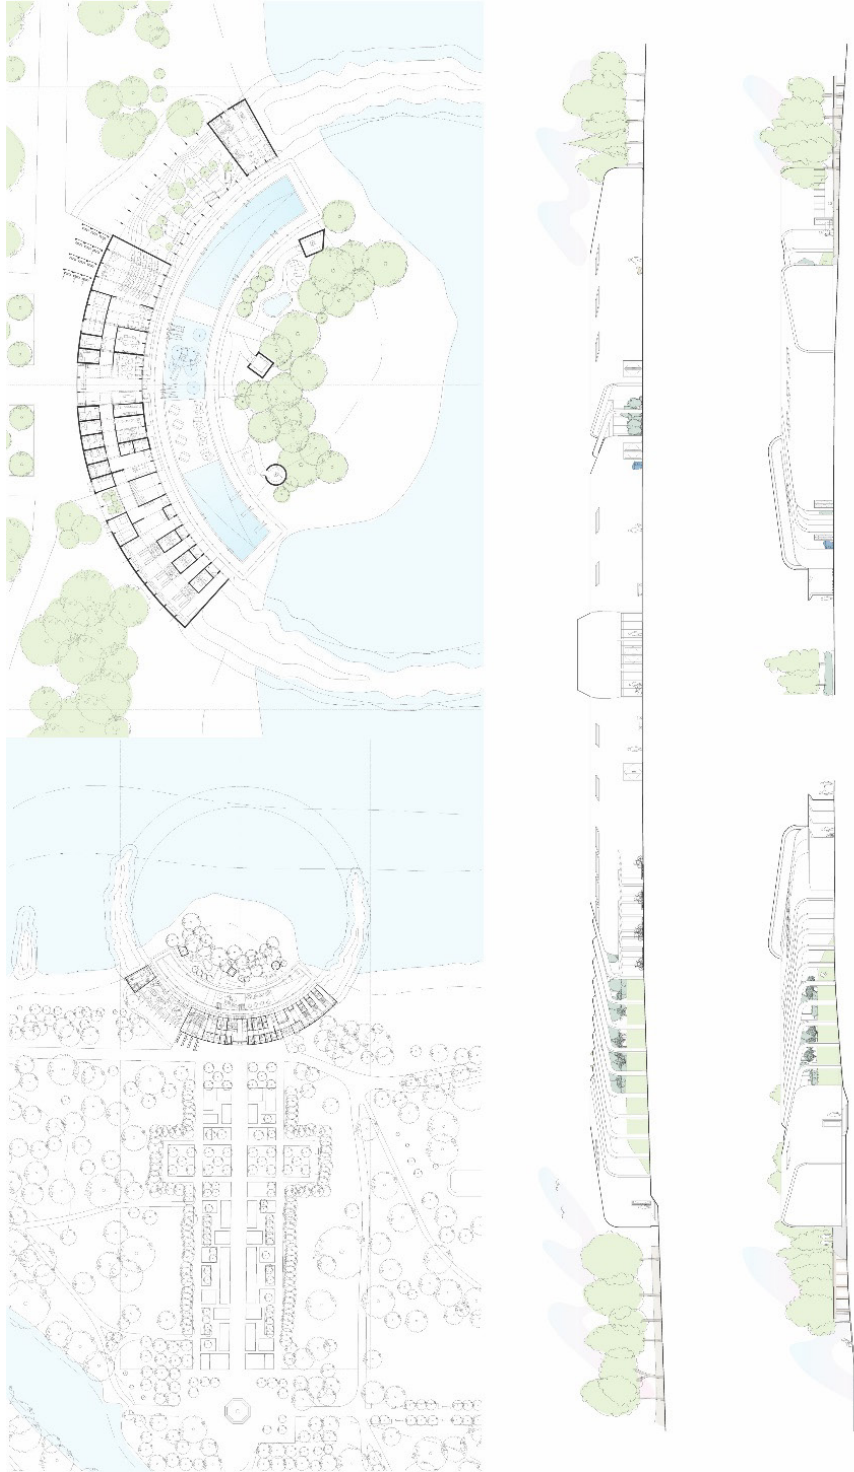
Top left: Site Plan, Top right: Floor Plan, Bottom: Elevations. (Source: By Author)
